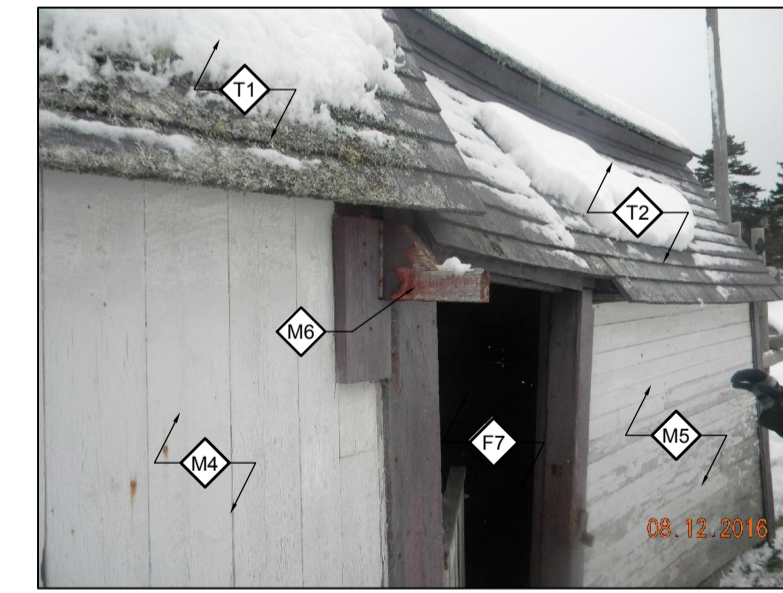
GUTTER SUPPORT TO REPLACE
